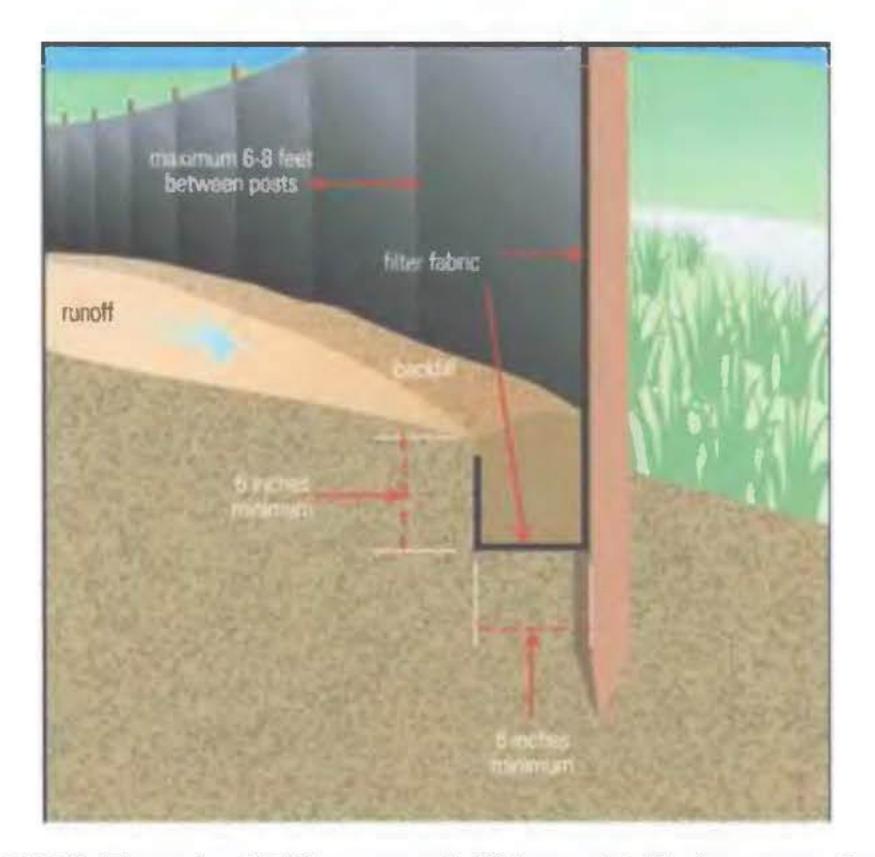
Example of EPA approved silt fence detail – temporary fence used during site works / construction phase.
